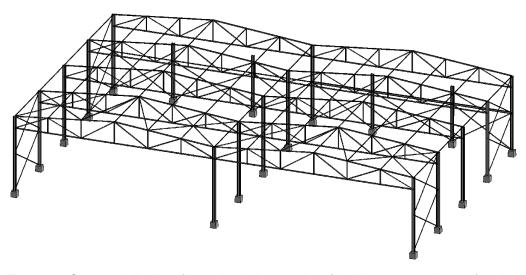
Structural design of hypothetical example 4 (double span steel truss framing with trapezoidal uprights)
